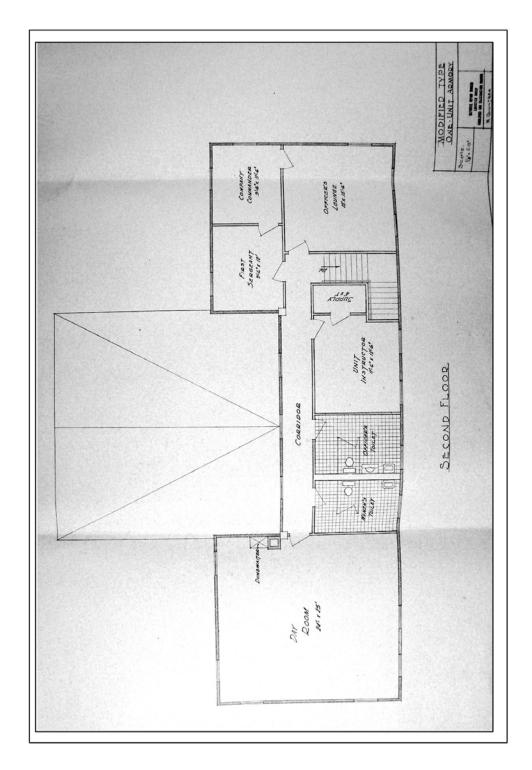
second-floor plan drawing for a one-unit armory (courtesy of the National Archives II, College Park, MD, Army-National Guard Bureau Decimal File, 1946-1948, RG 68).
